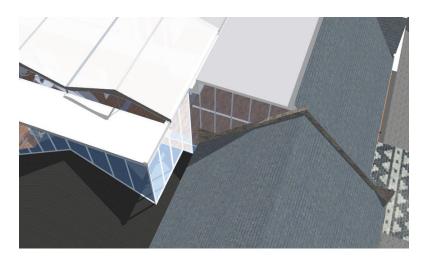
Additional sketch view of 1877, 1882 and new building junction. Note all new building is separated from the 1877 at the roof level, therefore avoiding complex and unsightly seismic and water-proofing detailing and allows the highly significant heritage façade to be unveiled in full.
